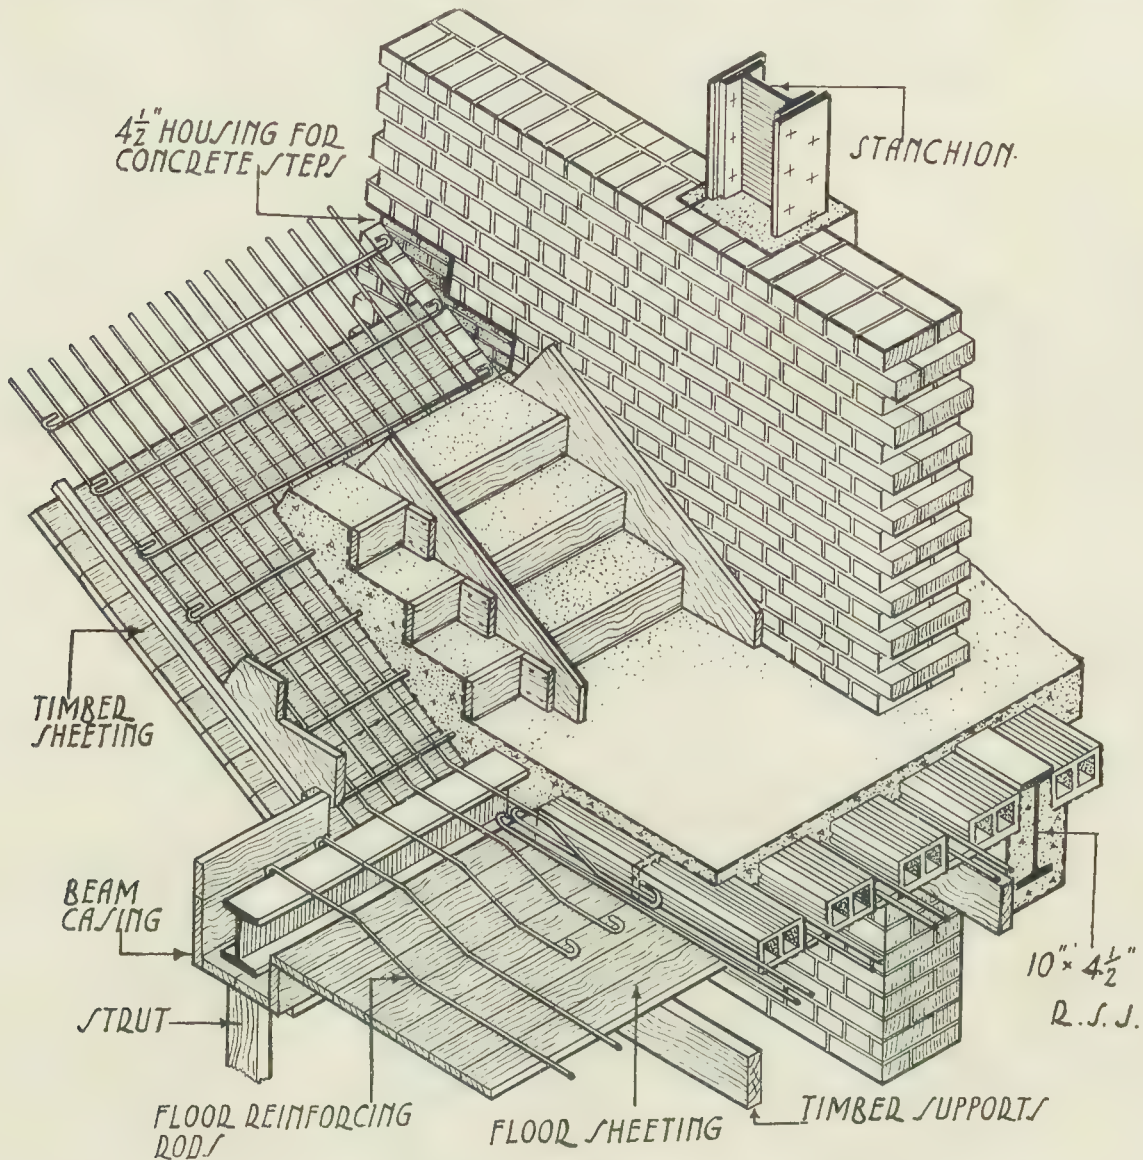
CONSTRUCTION OF A REINFORCED CONCRETE STAIRWAY
